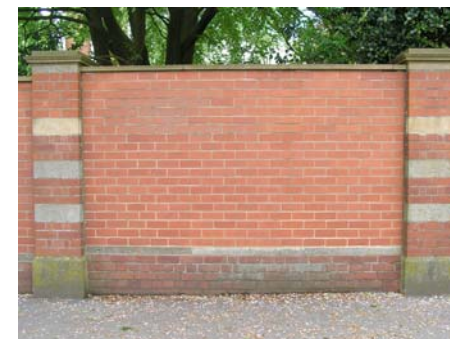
Detail of the boundary wall along Bishopthorpe road
